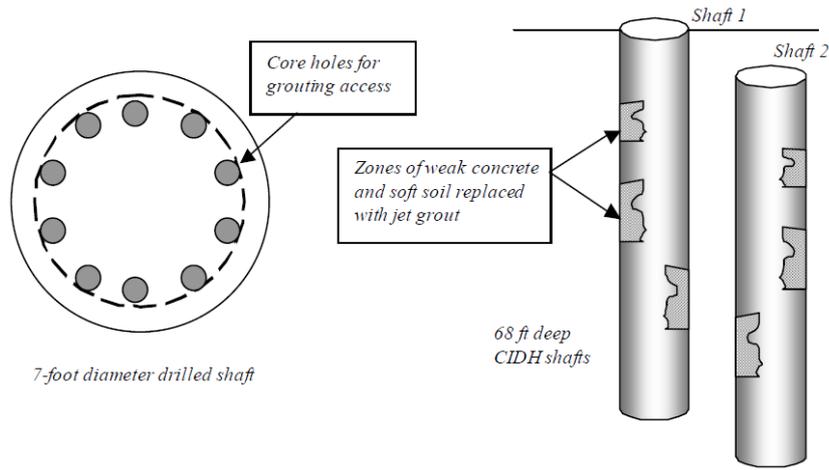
Layout of core holes for grouting and weak zones identified through CSL
